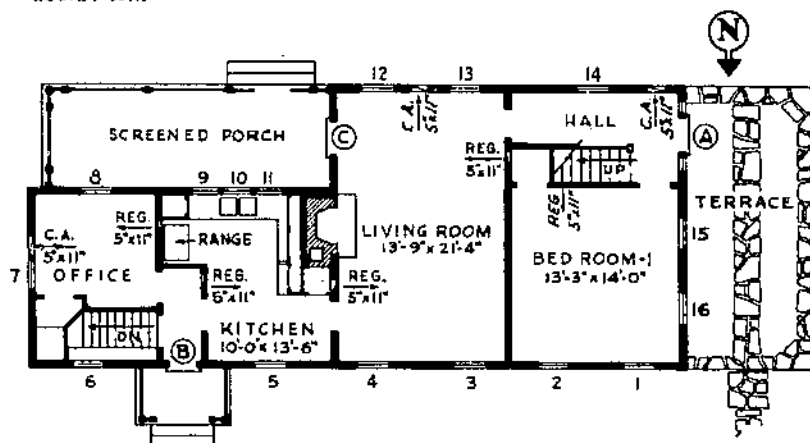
First-floor plan of house No. 4-R, showing changes in room arrangement and location of warm-air registers and cold-air returns.
